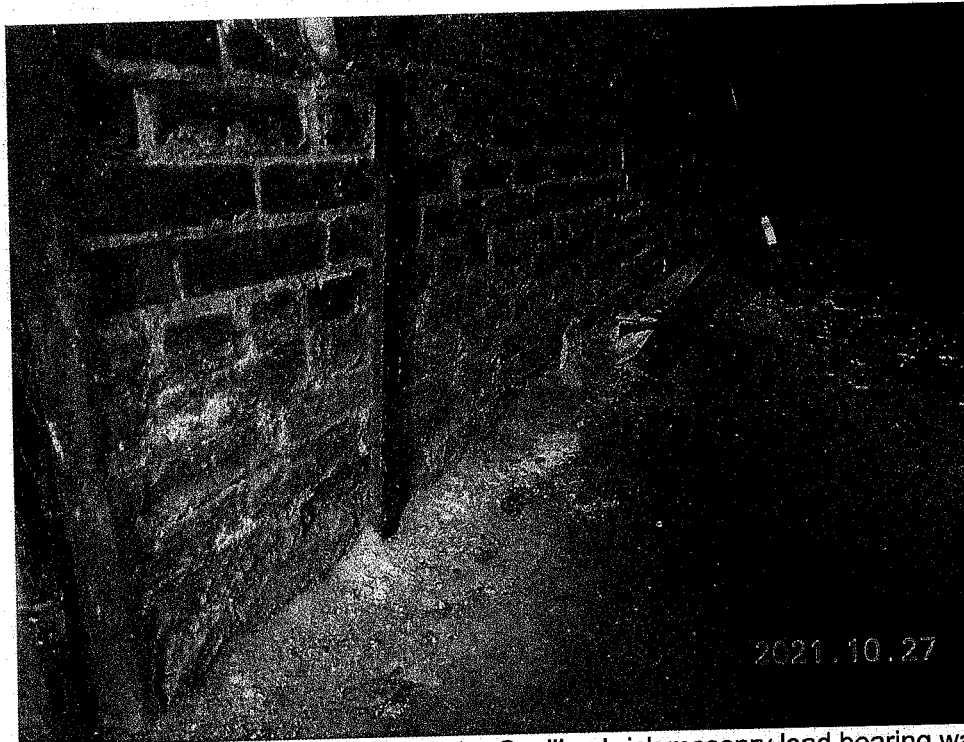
Routine Repair 1 – Spalling brick masonry load bearing wall with deteriorated mortar joints – Lower Level, Grid B/5-7
